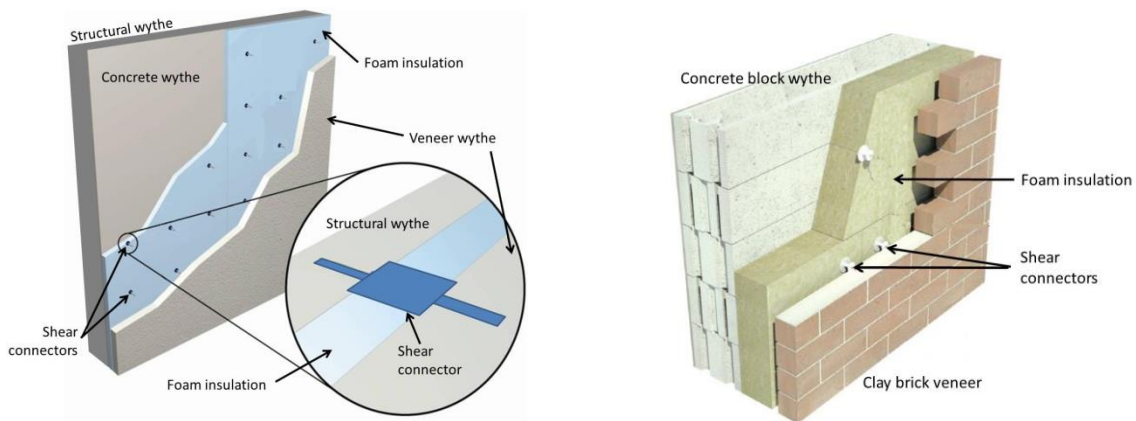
Illustrations of unsymmetric sandwich structures (a) precast and (b) masonry
